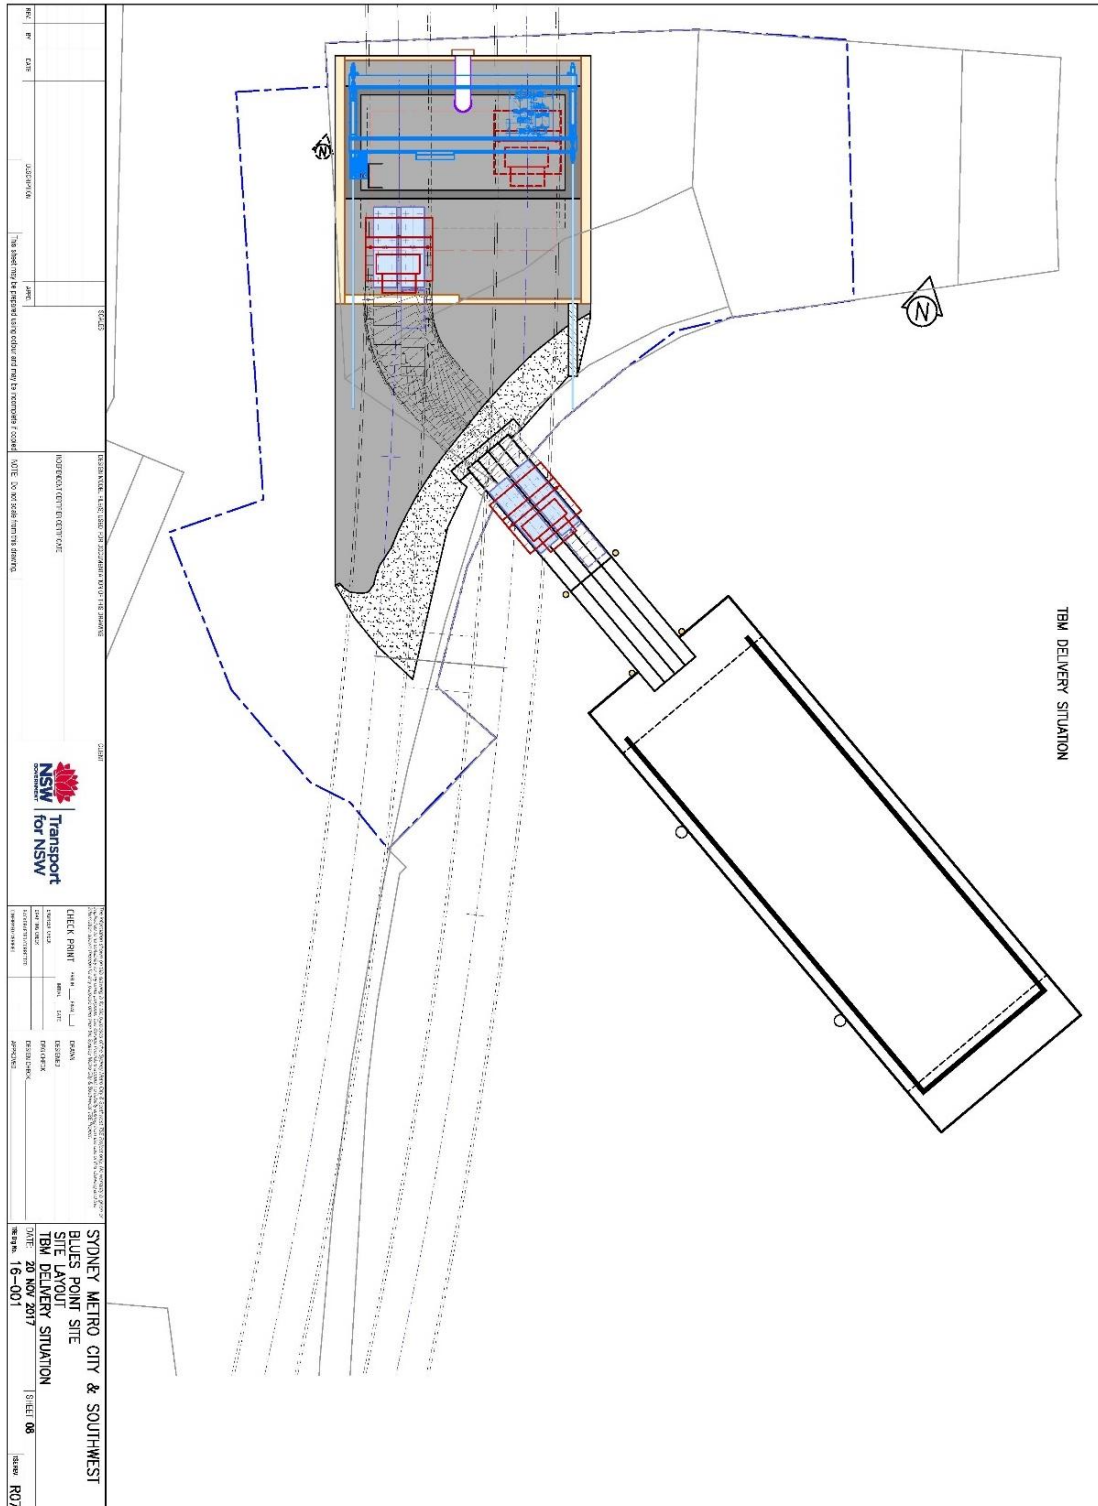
Indicative concept drawing of the proposed barge with ramp. Sydney Metro City & Southwest, Blues Point Site, Site Layout Overall Plan, 20/11/2017, Sheet 08, 16-001, R07.
